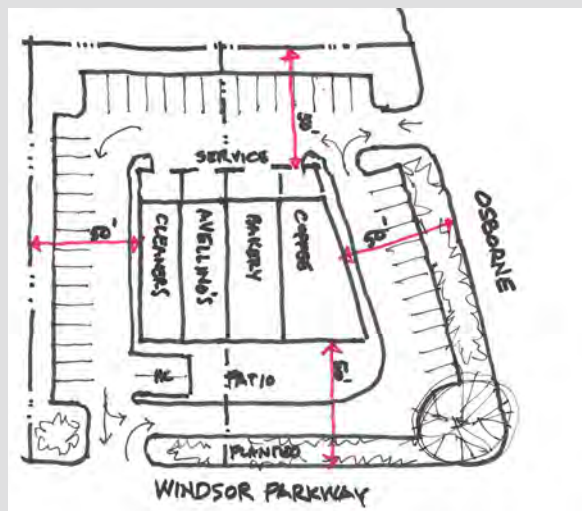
Sketch plan of Windsor Parkway at Osborne Road
